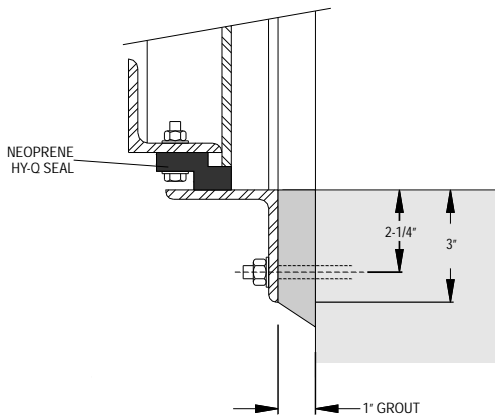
Series 623- Invert Seal, Stainless Steel Embedded Frame In-of-Channel Mounting with HY-Q Seal; SectionBB
